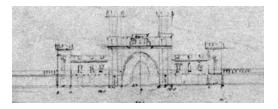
B: Detail of "Walter" plan, showing sketch of a proposed gatehouse.
